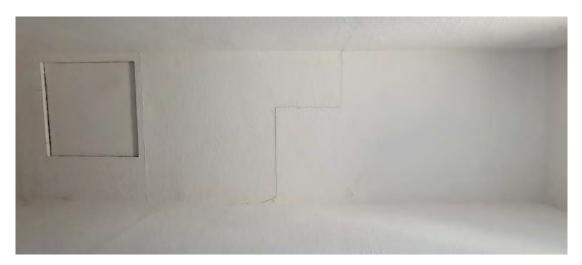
Cracking of stair ceiling between main level and upper level. Cracking is indicative of building movement/settlement.
